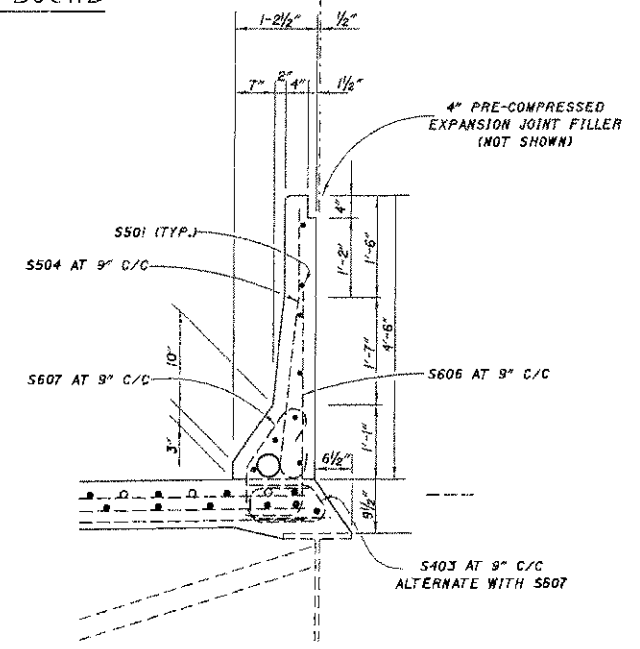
DETAIL OF DECK CUT LINE AND LONGITUDINAL CONSTRUCTION JOINT FOR PHASE CONSTRUCTION
